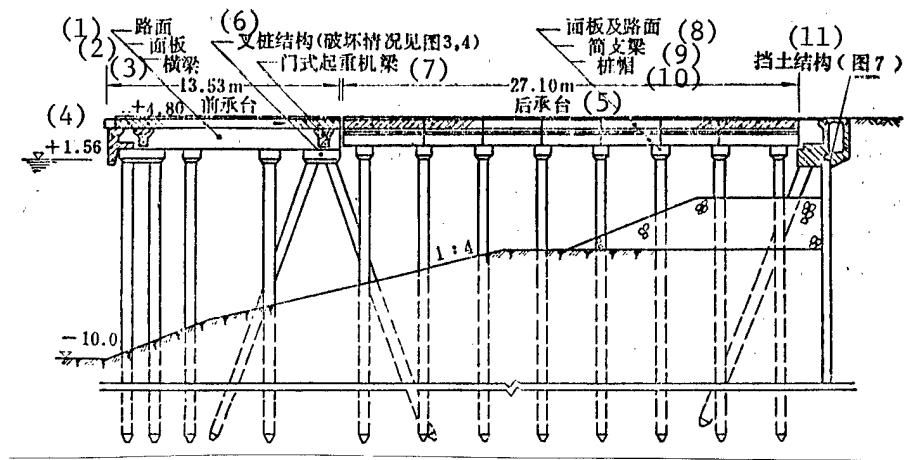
Cross-section illustration of the pile-elevated docks at seaports (ninth berth of Xingang, Tianjin; elevation in meters)
